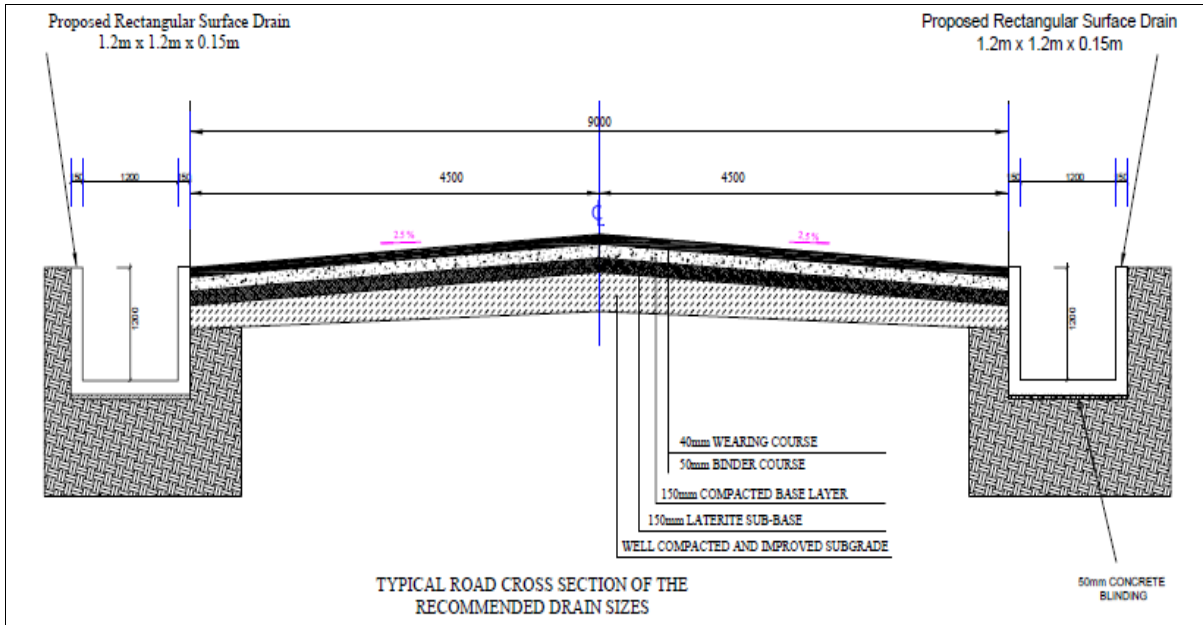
Typical Road Cross Section of the Recommended Drain Size
